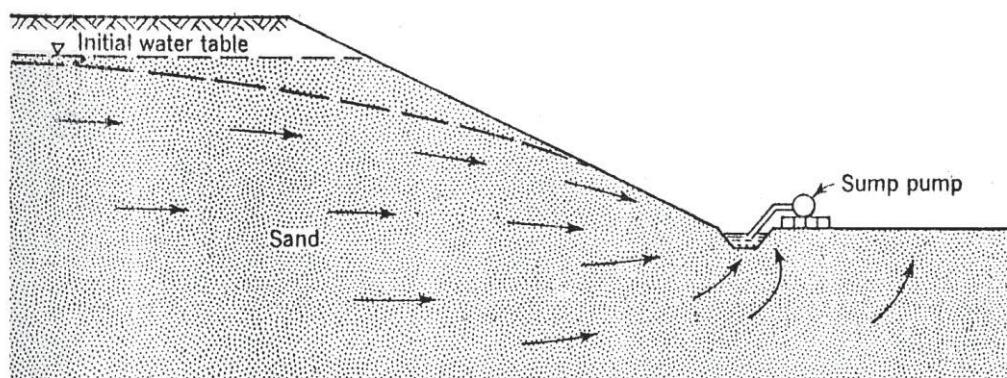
Sumps and Ditches (Leonards, 1963)
